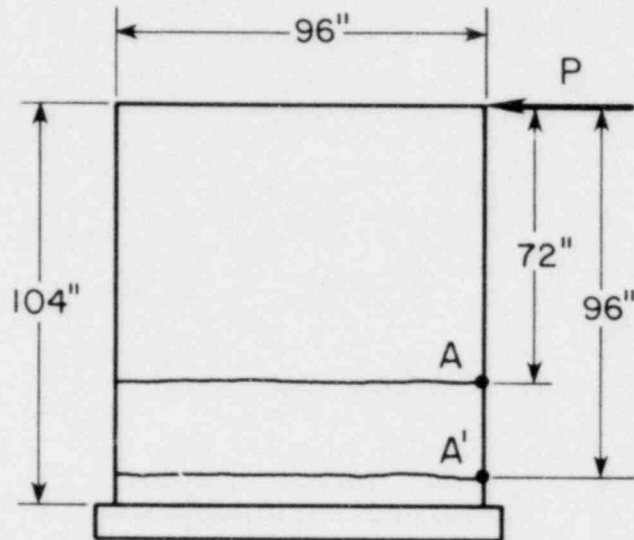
CRACK LOCATIONS IN WALL W3 OF HOUSE 1
